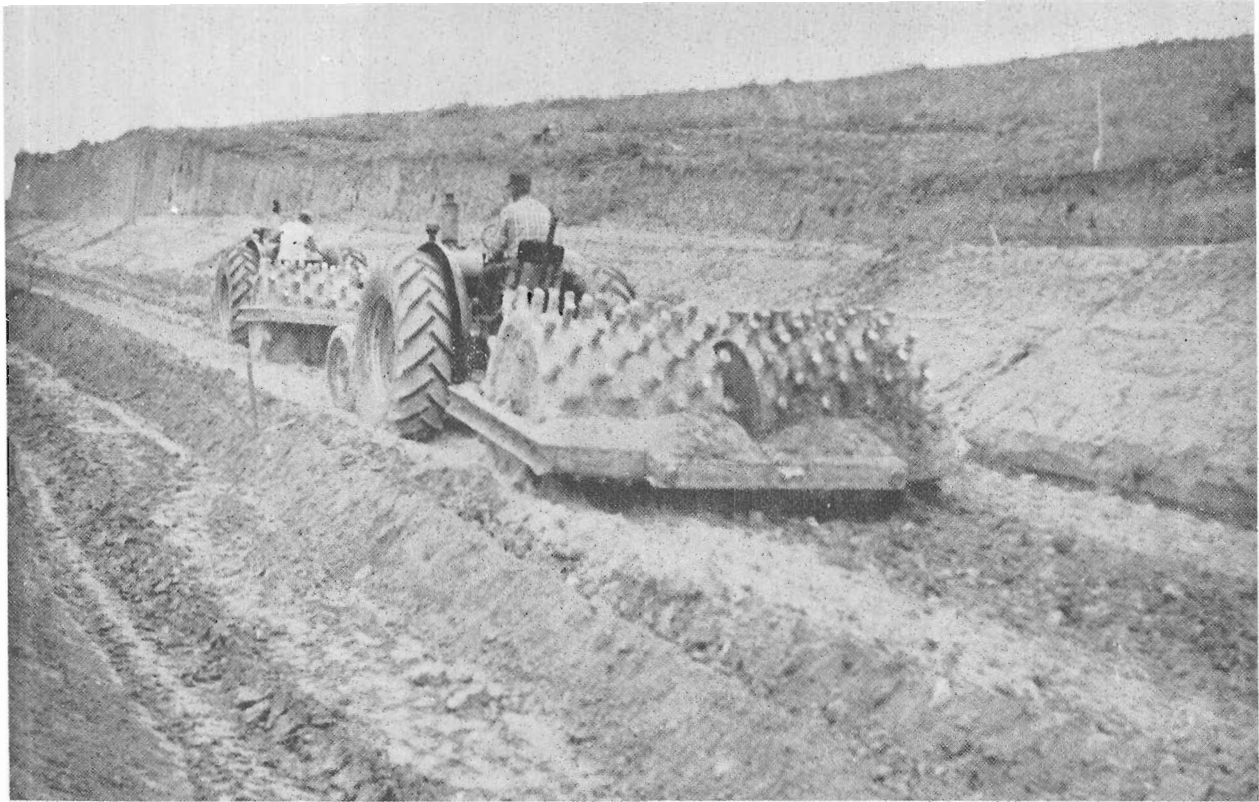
Sheepsfoot roller compacting asphalt-emulsion-treated soil after mixing was completed with rotary tiller. CH-575-12.
